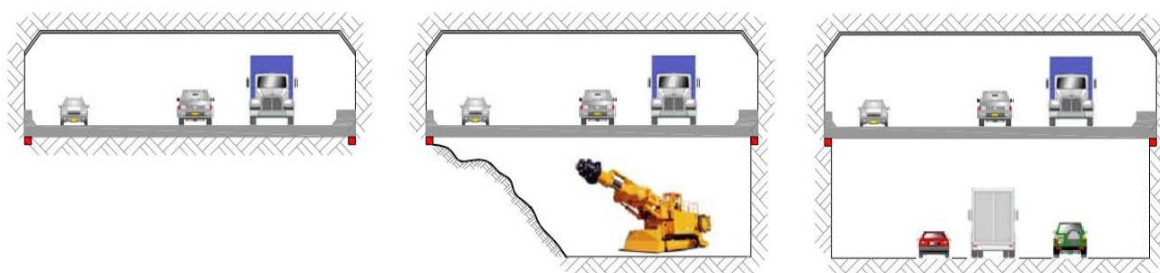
Expanding the capacity of existing tunnels by excavating beneath them
